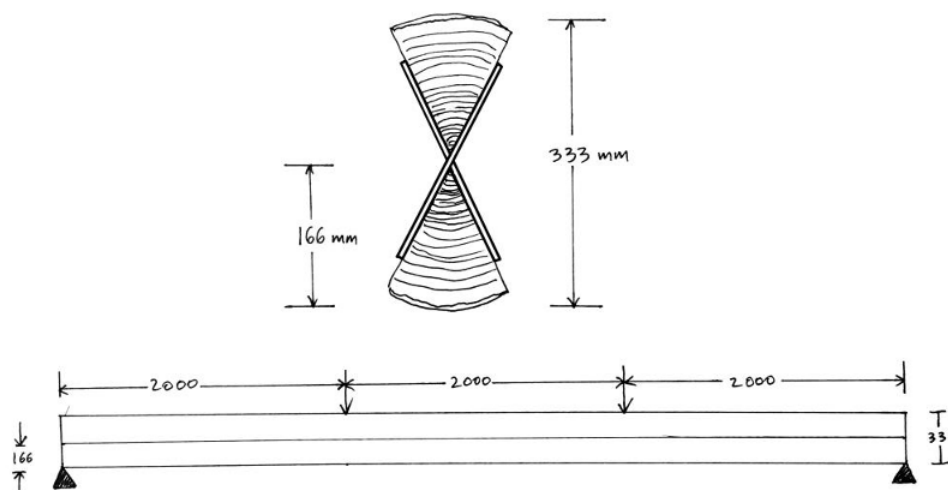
Top - Cross-sectional drawing of the XR-beam showing end-grain and interlocking gussets (not to scale). Bottom - Loading diagram based on proportions defined in BS EN 408:2010+A1:2012.
